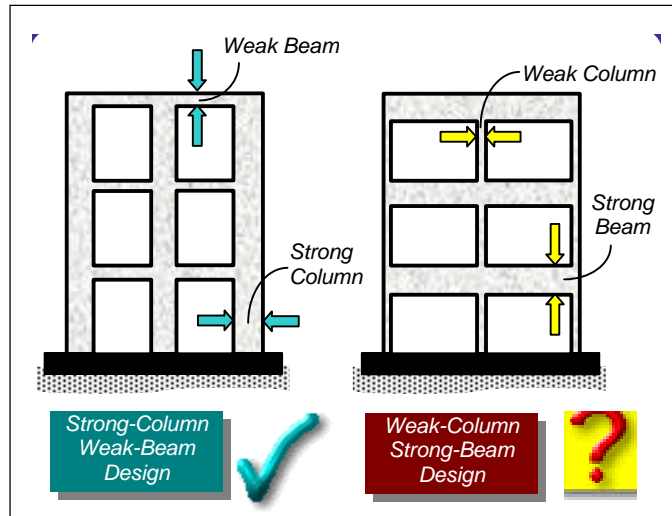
Reinforced Concrete Building Design: the beams must be the weakest links and not the columns – this can be achieved by appropriately sizing the members and providing correct amount of steel reinforcement in them.
